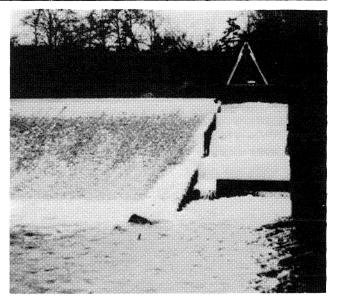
A dam and fishway are situated on Chambers Creek at the head of tidewater.
